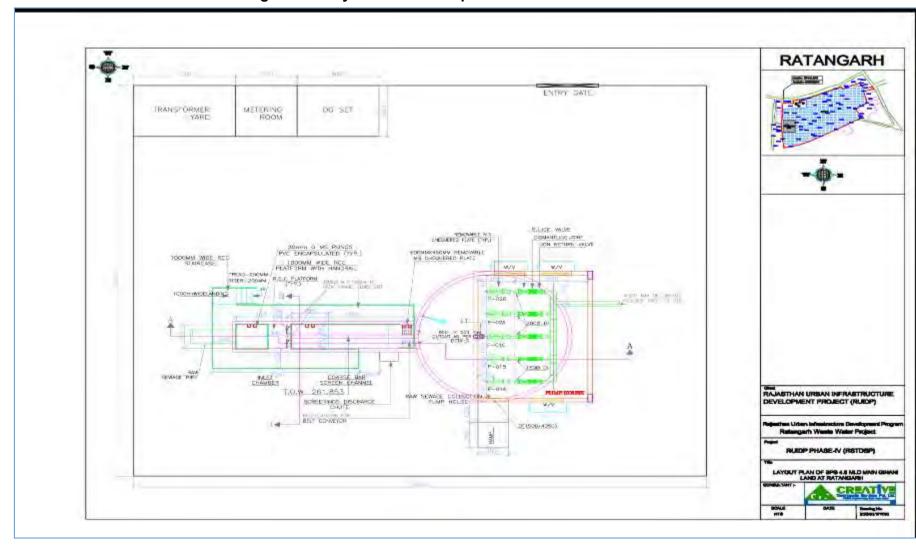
Layout Plan for Proposed SPS 2 near Main Ginani
